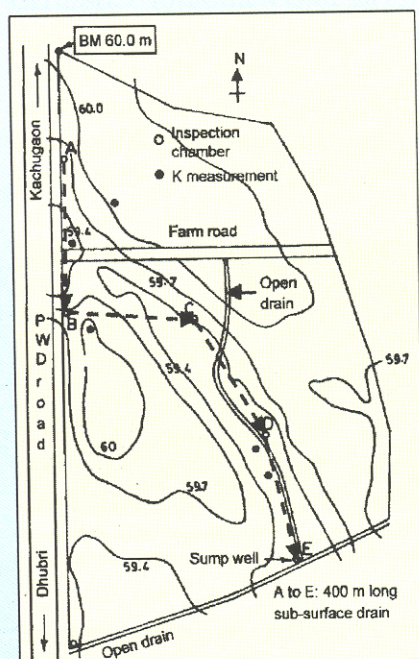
Random layout of subsurface drainage in an 11 ha tea garden in Assam
